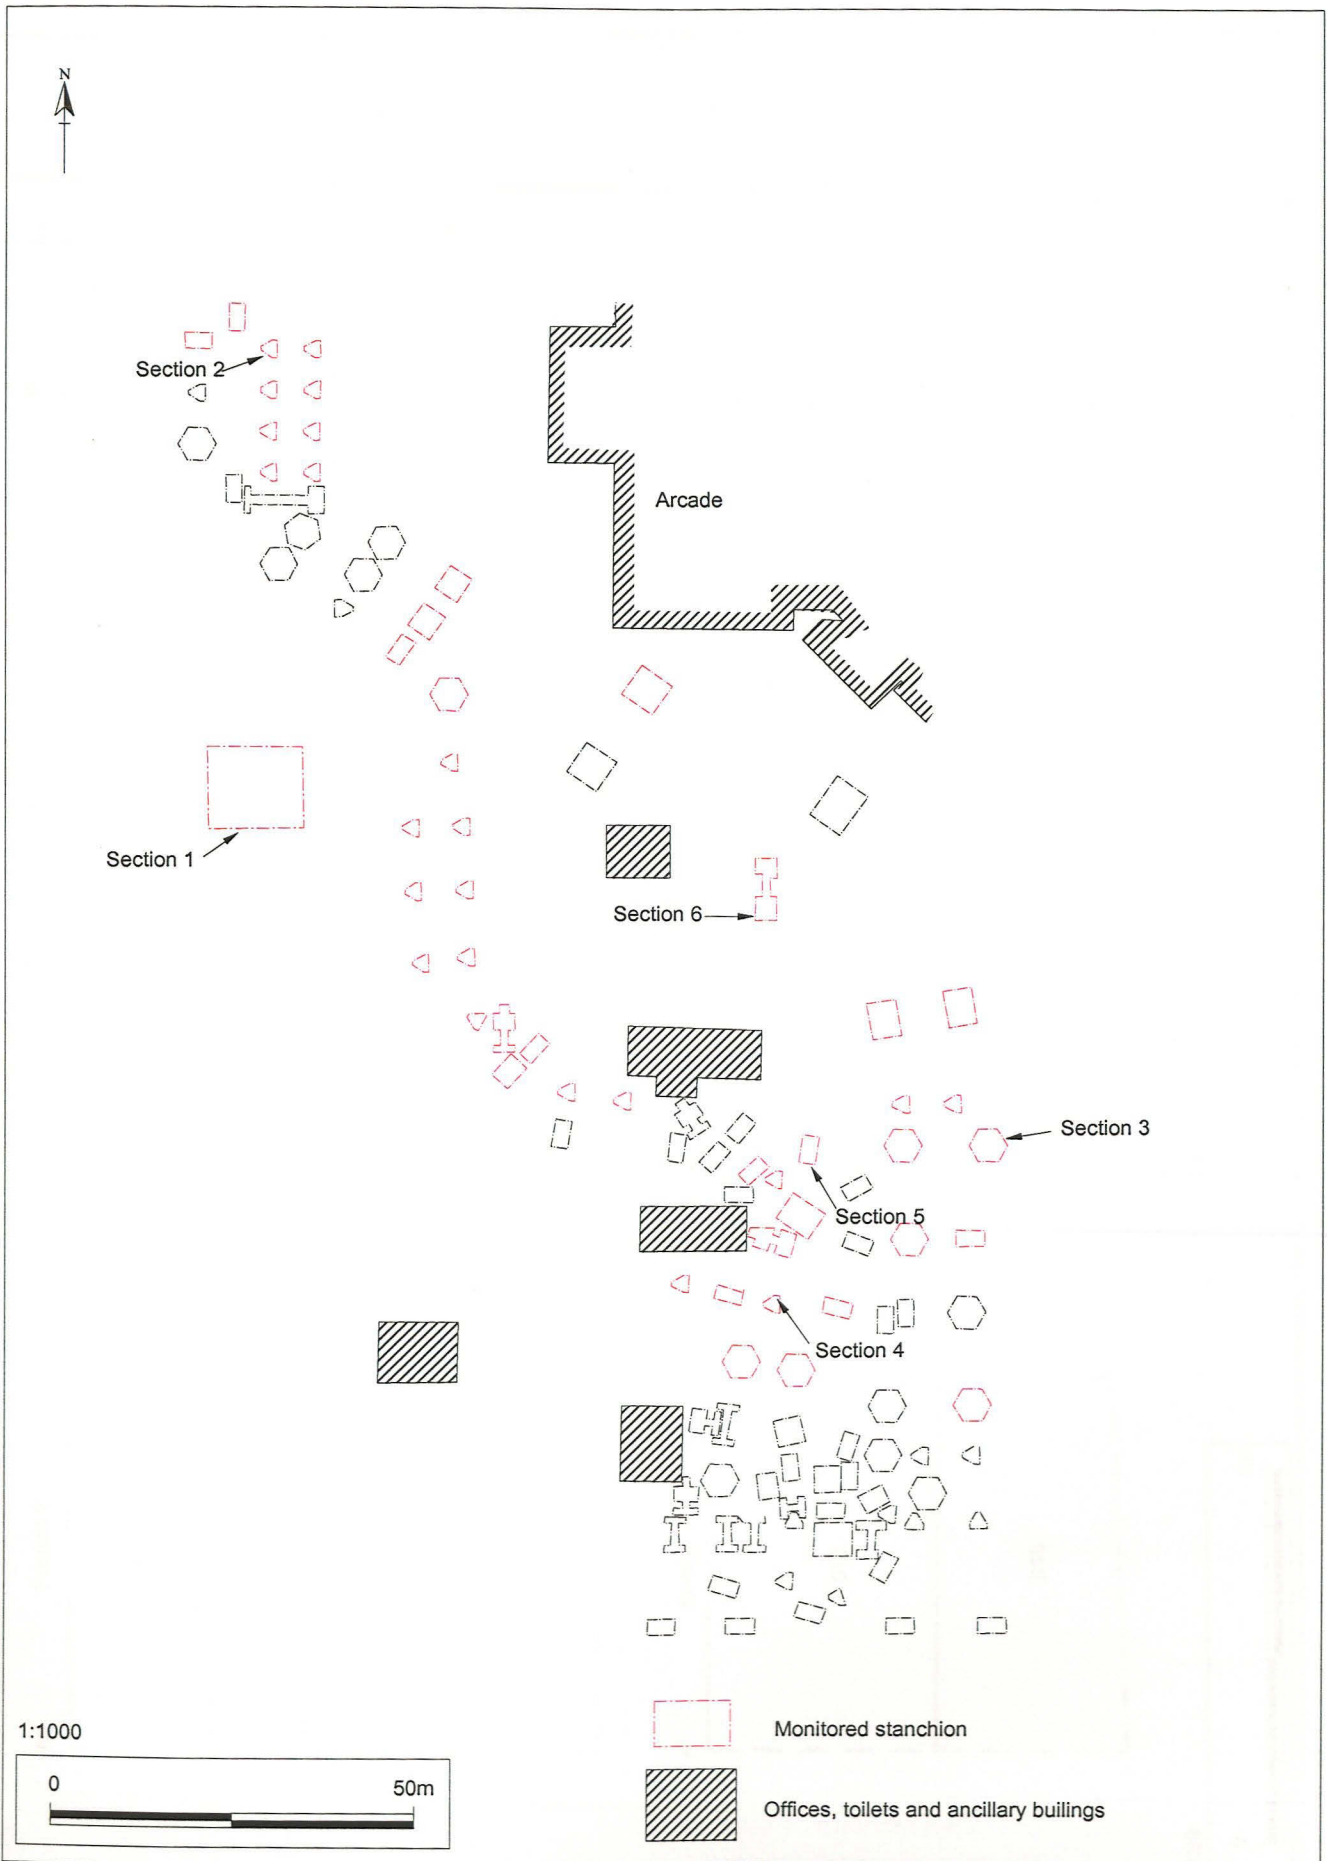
Stanchion Plan showing section locations and monitored stanchions
